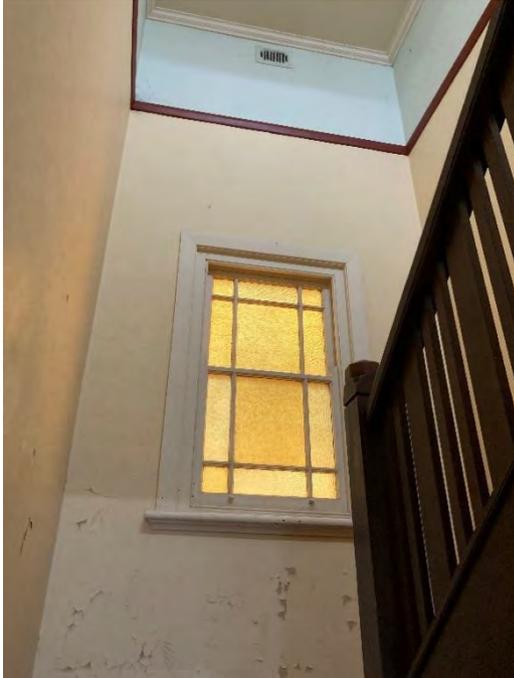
Multi paned, timber framed single hung window at the first landing of the timber staircase.
